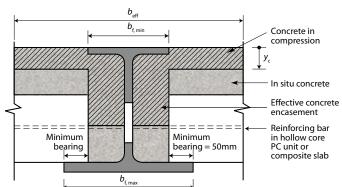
USFB[®] with bar reinforcement in the concrete 'plug'
